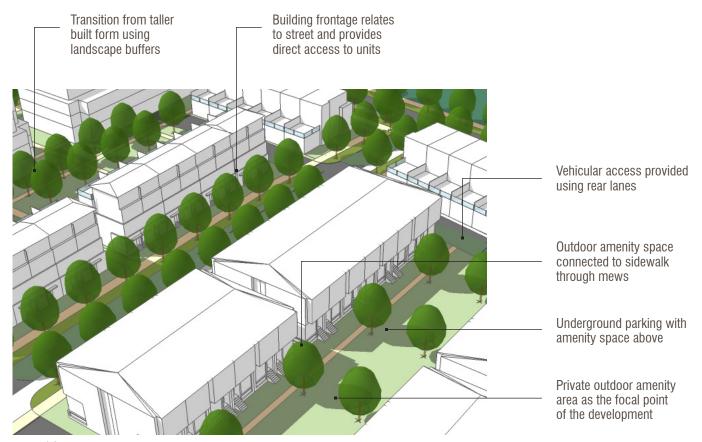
Demonstration plan illustrating some of the stacked and back-to-back townhouse guidelines
